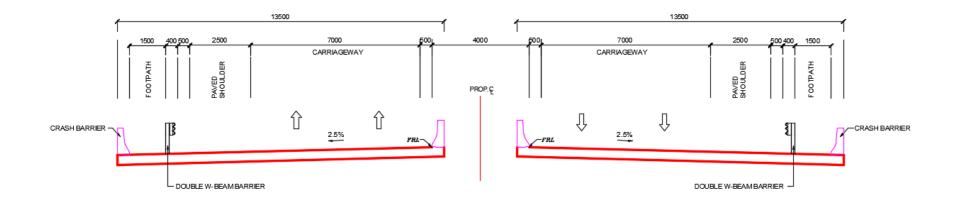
4-Lane- Bridge at Deck Level with Footpath Bridges without Service Road (TCS-12)
